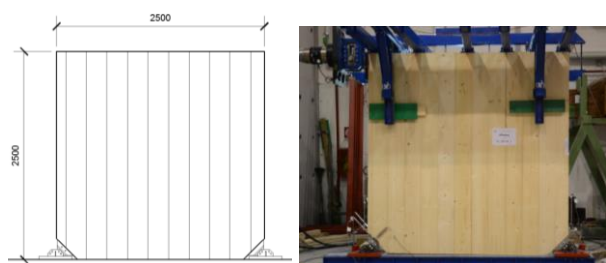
Test on CLT wall connected to the foundation with X-RAD
